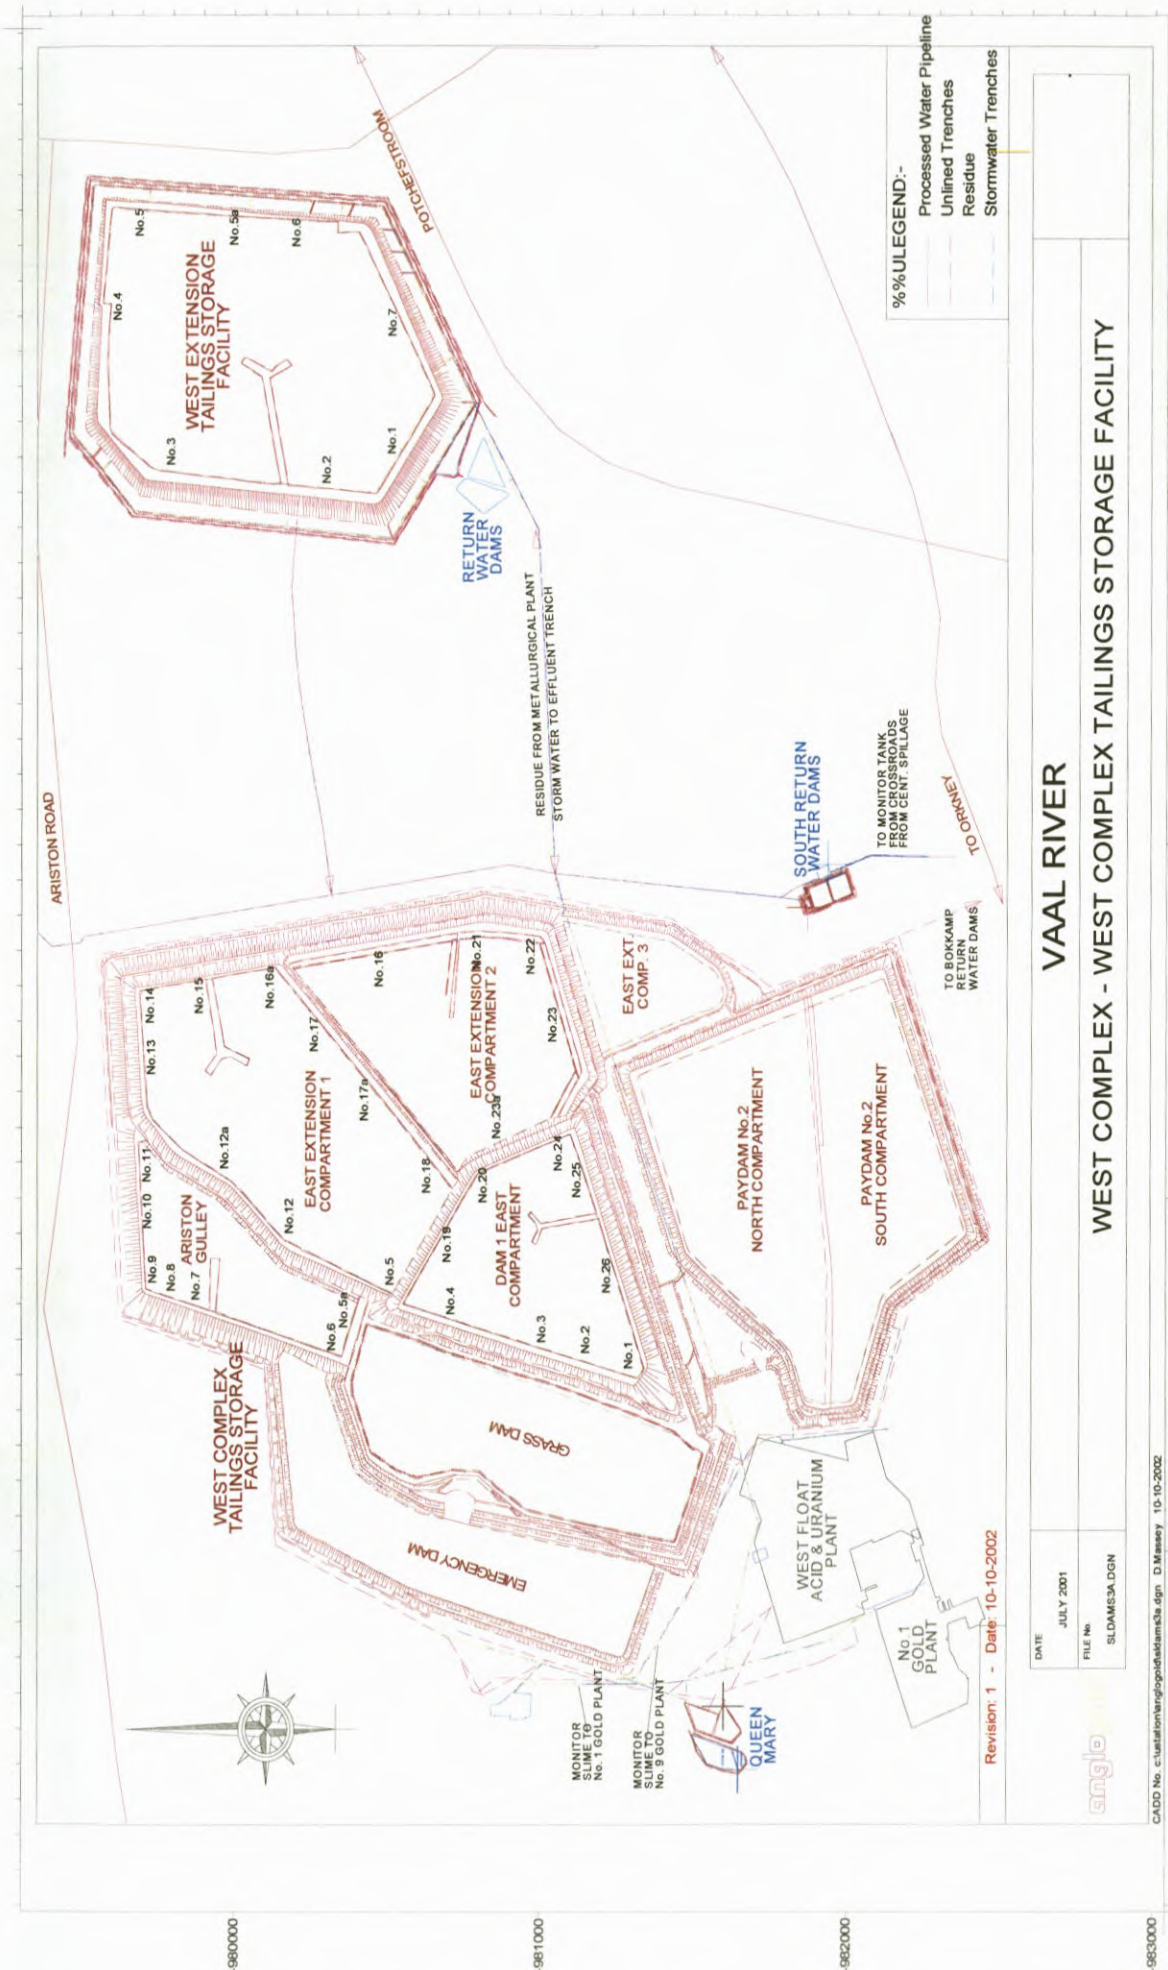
Layout Plan of the West Complex (WC-TSF) and West Extension Tailings Complex (WE-TSF) with the Metallurgical plants in the south western corner of the plan
